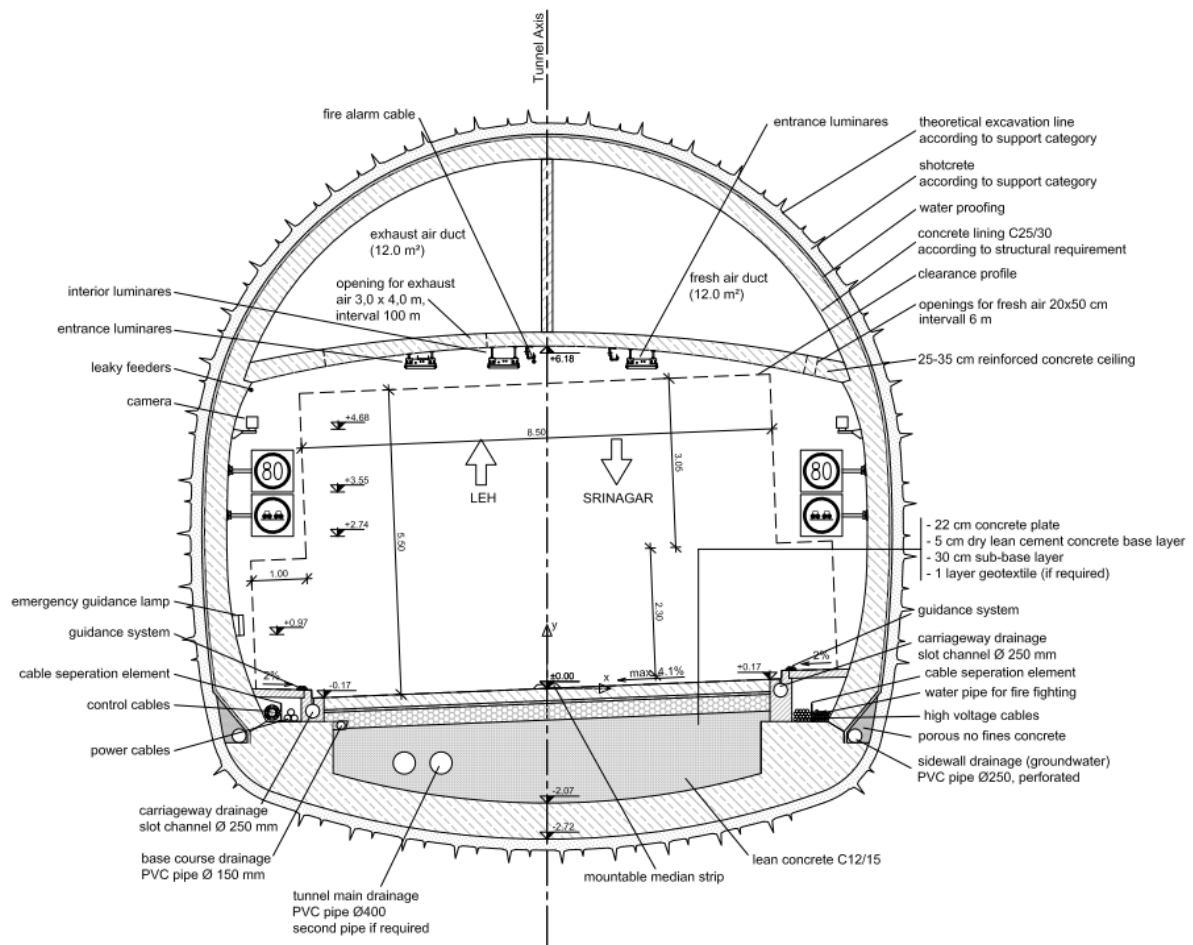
Typical cross section for bi-directional single tube tunnel with invert
